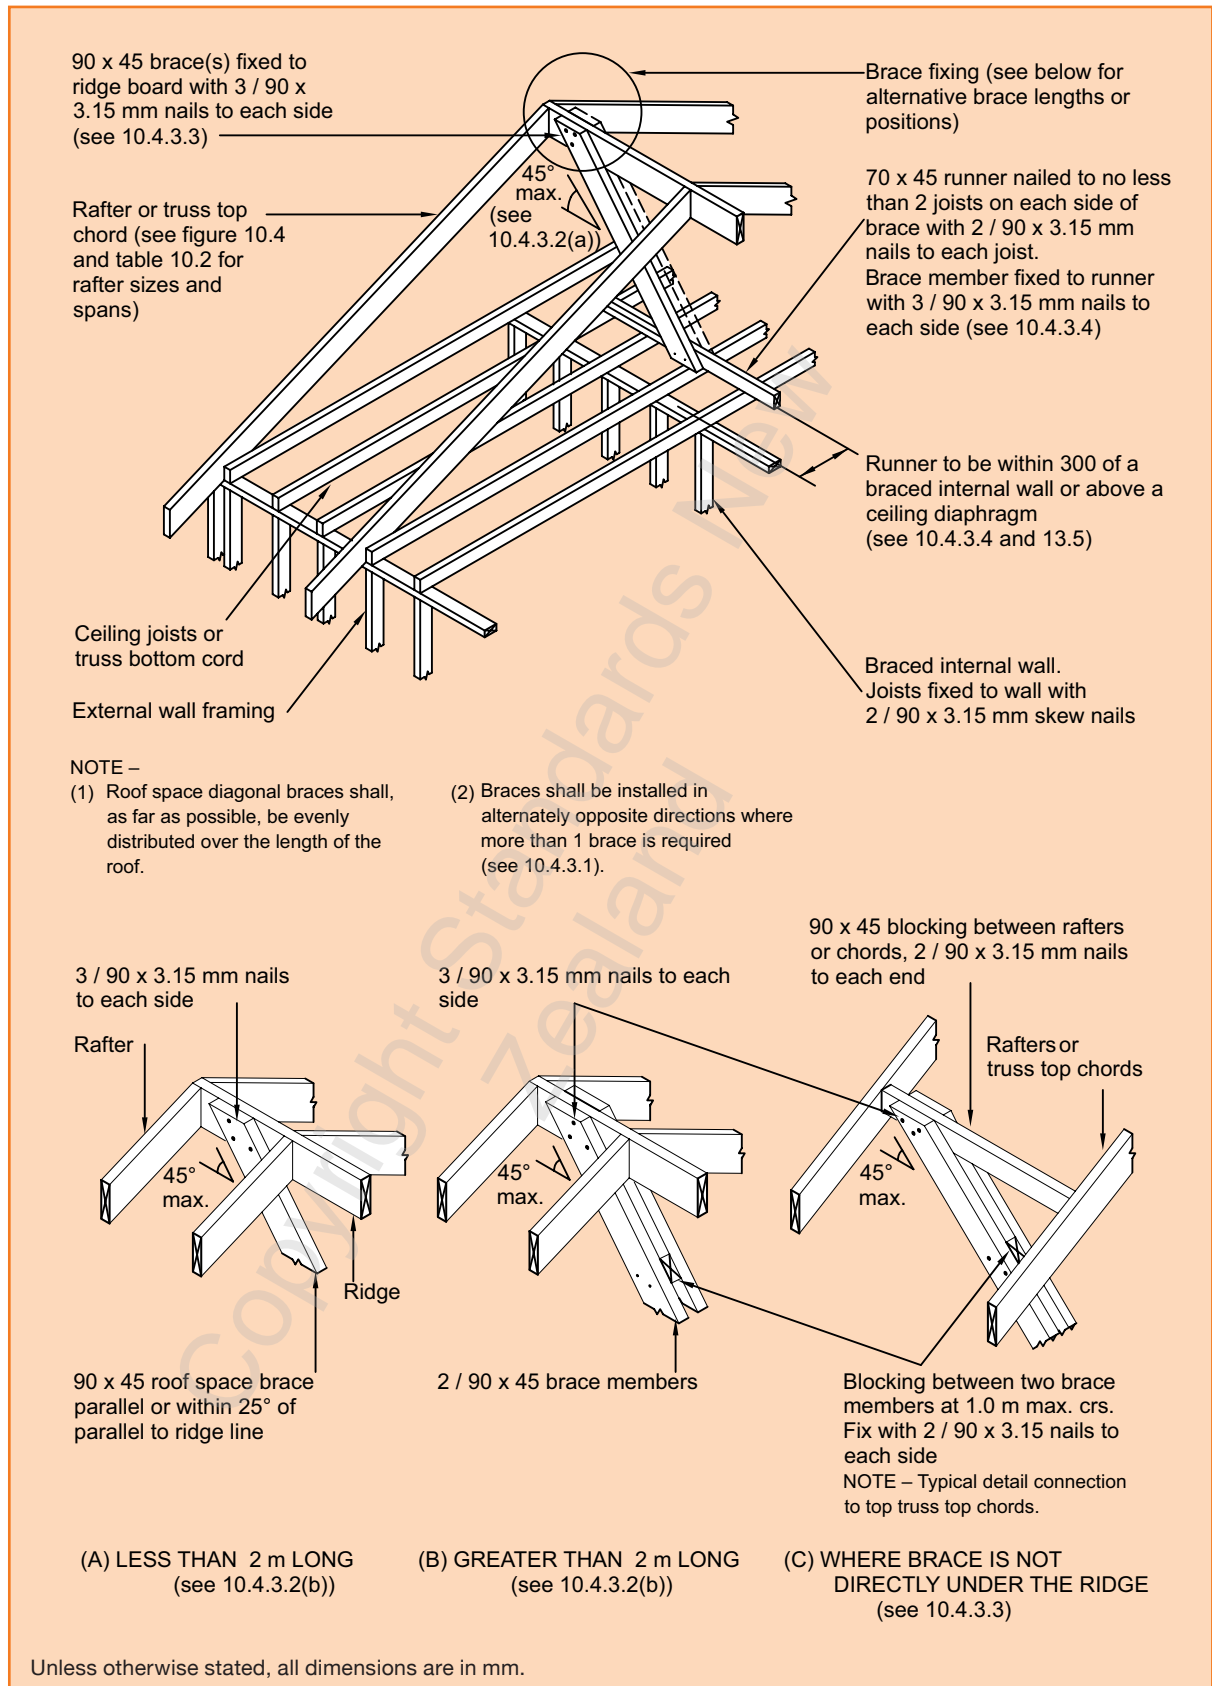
Roof space diagonal brace – Alternative fixings (see 10.4.3)
